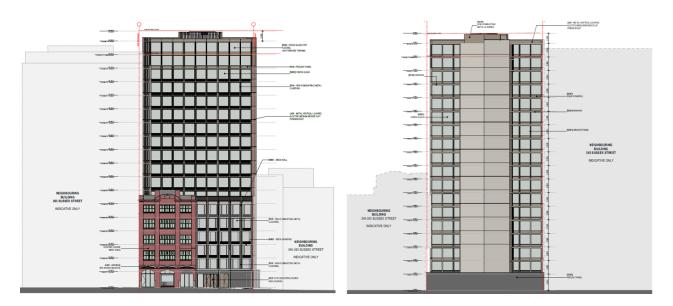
Original Scheme (11 May 2022), Proposed East Elevation (left) and West Elevation (right)
